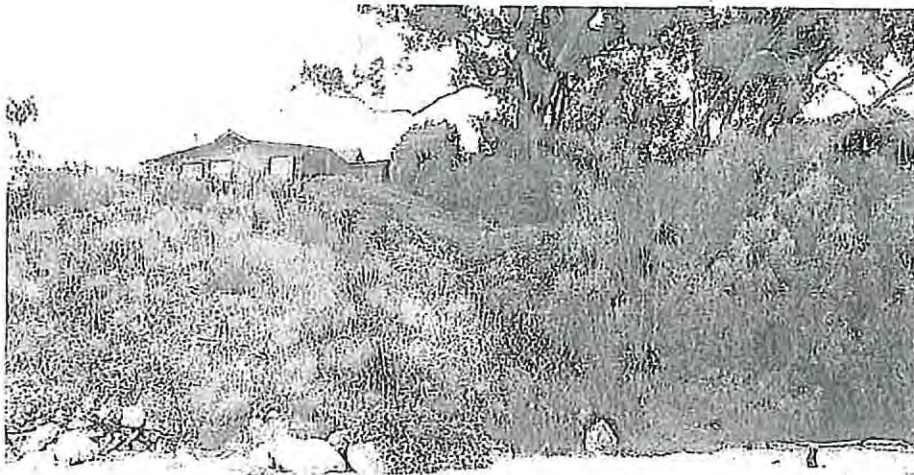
Drainage culvert, rip-rap slope protection, and old concrete foundations, viewed to northeast.
